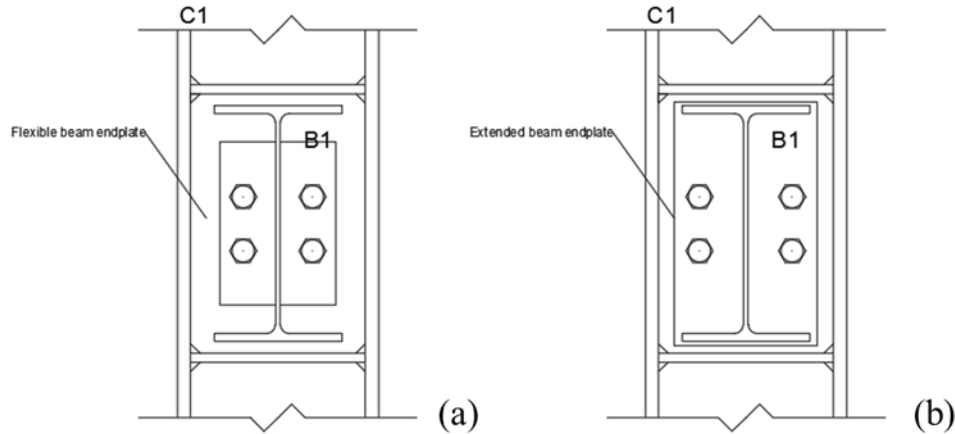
Beam to Column Connection with (a)Conventional and (b) Extended Flexible Endplate
